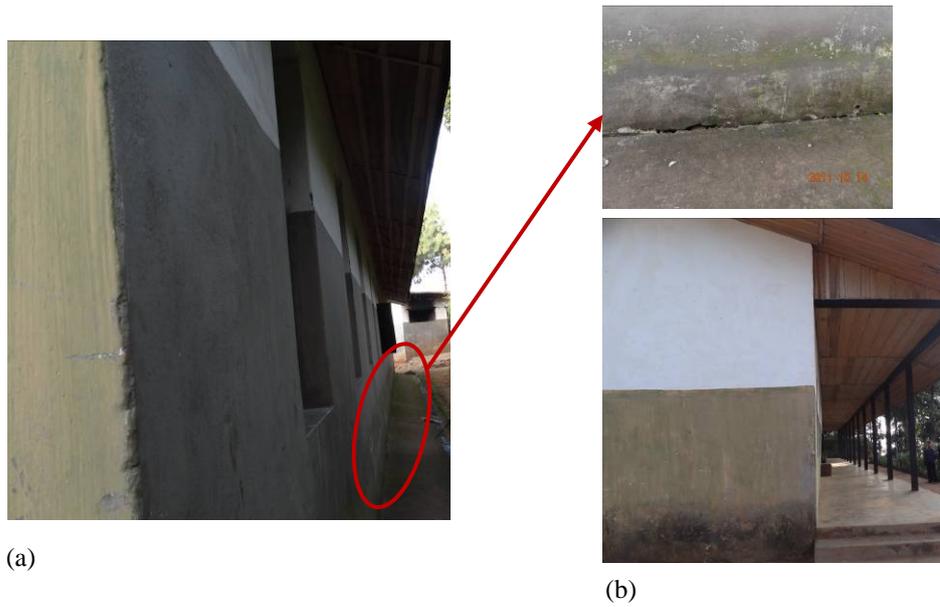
A damaged single-story load-bearing stone masonry (mud mortar) building: (a) with permanent out-of-plane deformation of back wall and cracks at the base and (b) with permanent out-of-plane deformation of front wall. The permanent deformation at a portion of front wall was about 5 cm. The building has a length of 36 m and width of 7.2 m with no interior partition walls. High length-to-width ratio of the building resulted in the damage. The false ceiling fell down during the earthquake. Although, the building is being used at the moment, the owner plans to demolish it.
